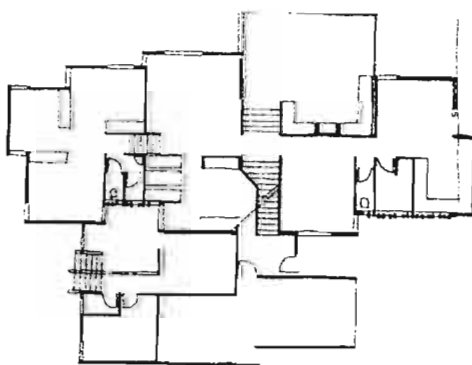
BDG – House van Schalkwyk (1969). Plan.
